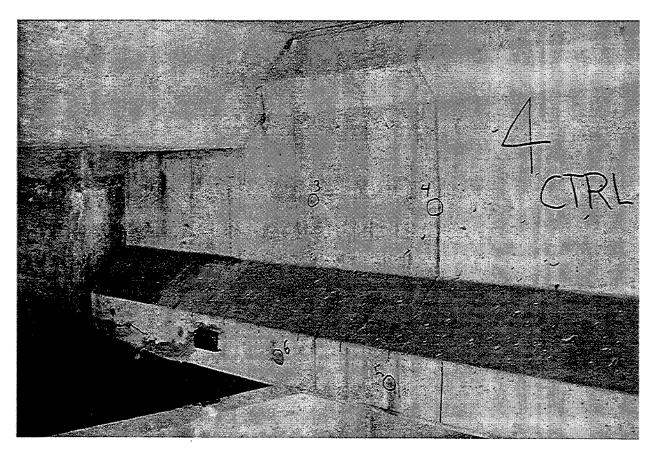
West side of Beam 4. Little evidence of water running down the face of the beam.
